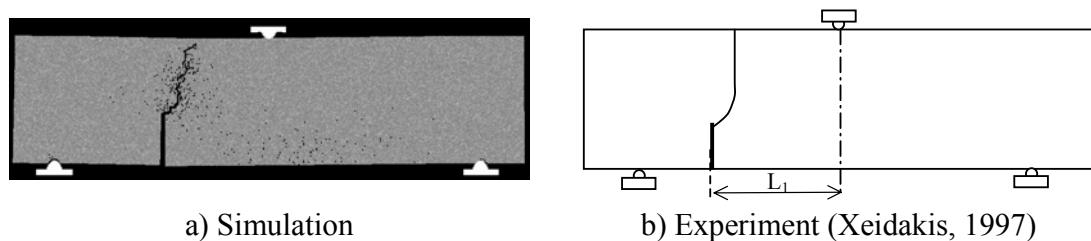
Final fracture pattern in asymmetrical three-point bending test
